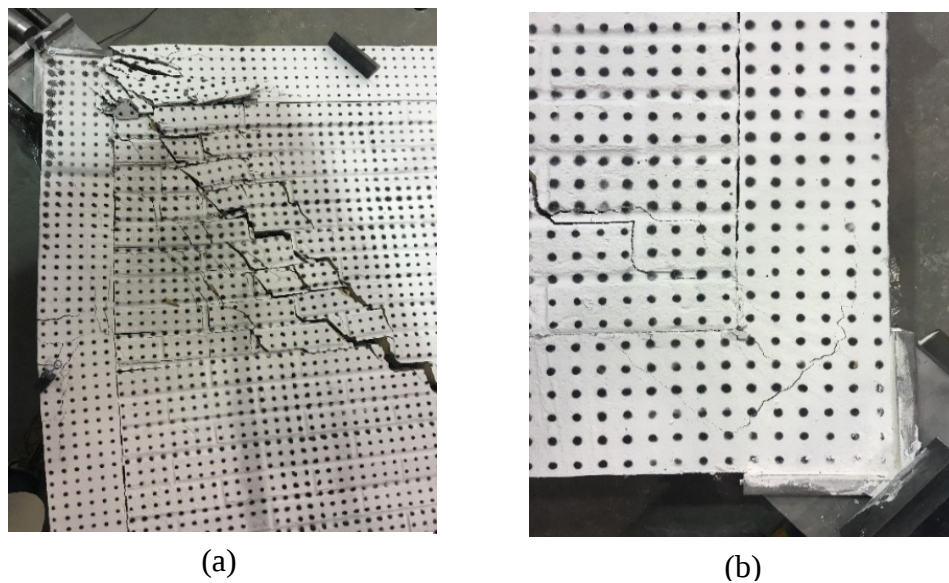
Crack distribution in masonry infill specimen after failure of the (a) loaded corner and (b) the opposing corner
